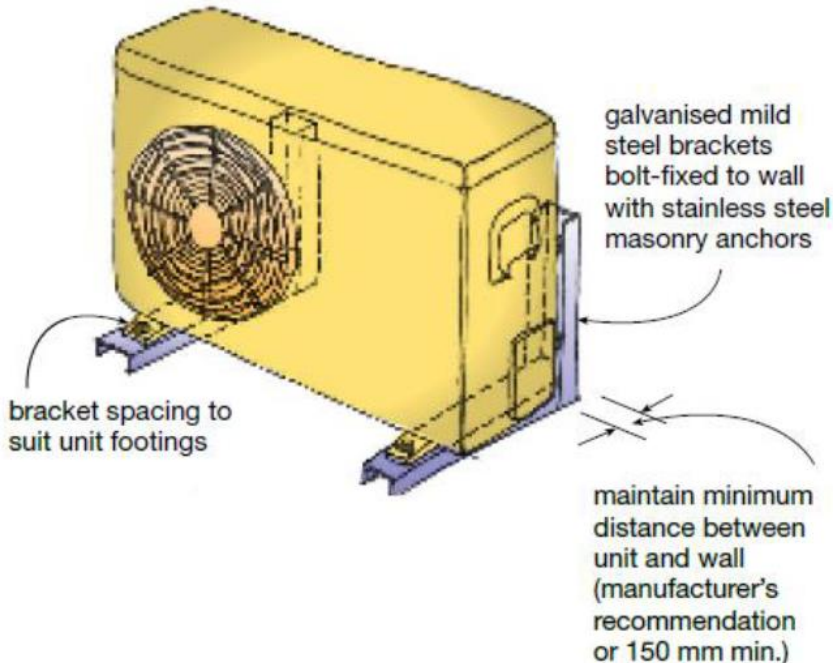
Wall Mounted Outdoor Unit on Bracket - Masonry Wall
